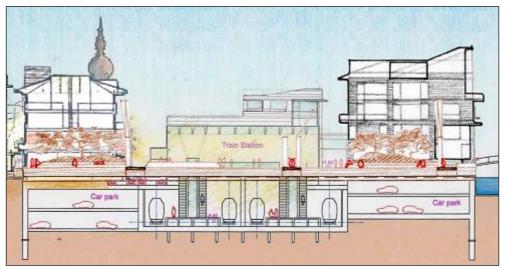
A section of the Planned Situation of Delft Spoorzone Project (Masterplan (2003)).
